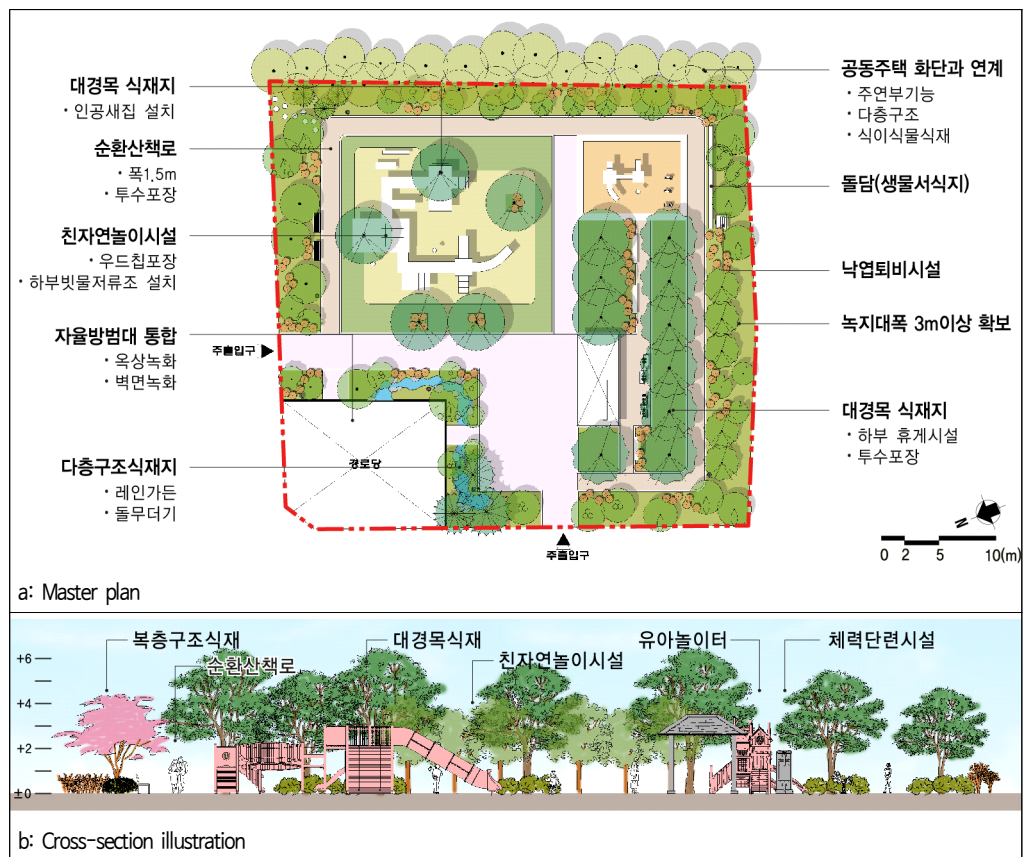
Master plan and cross-section illustration of Seonrin Children's Park
